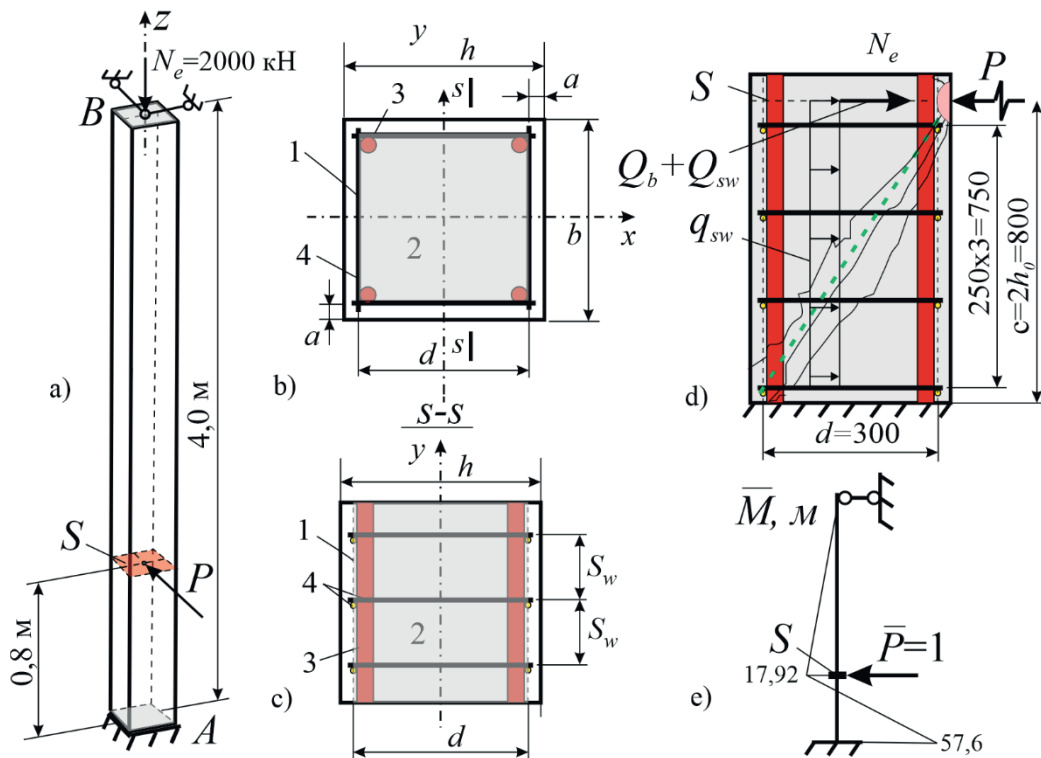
Reinforced concrete column with calculation parameters: design model (a), cross-section  $S$  (b); 1 - contour of the deformation confinement zone, 2 - core of this zone, 3 - longitudinal reinforcement, 4 - transverse reinforcement; cross-section  $s-s$  (c), inclined section (shear) failure scheme (d), bending moment diagram caused by unit impact (e)
